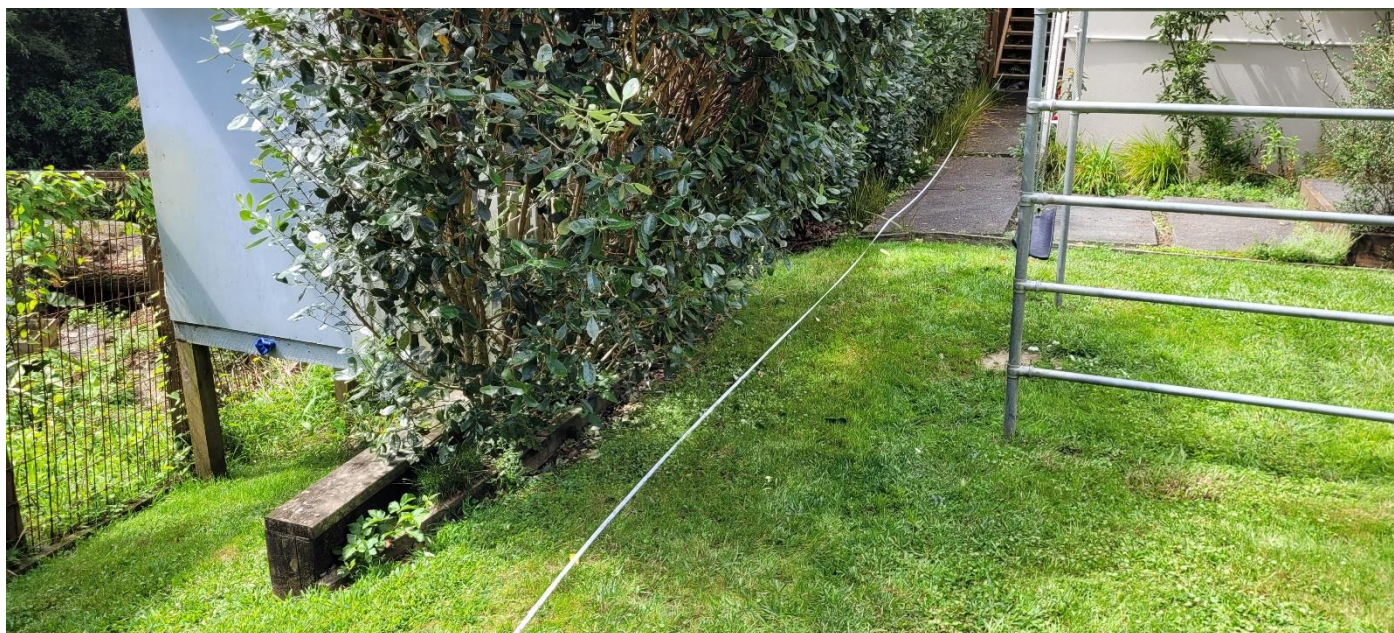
Looking southeast towards the playhouse and west end of RTW-01 to the north of the dwelling.
